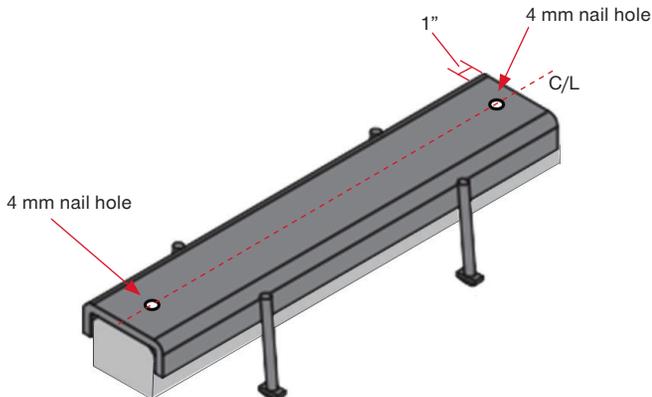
HAC-TU cut in shorter sections and nail holes added
